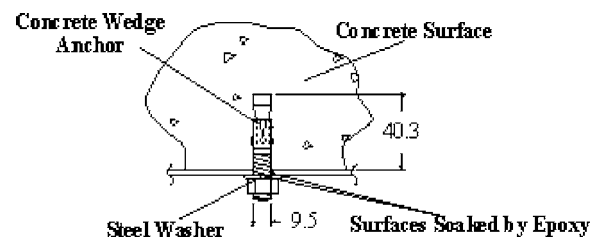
Details of the connection between concrete and CFRP precured laminate with wedge anchors (mm)
